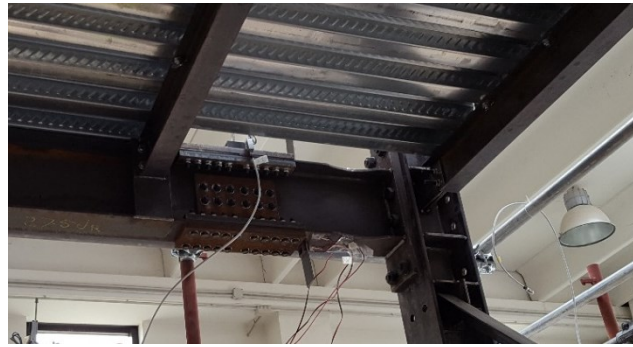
Building mock-up: detail of the gap between the slab and the column (structure equipped with RBSs)
